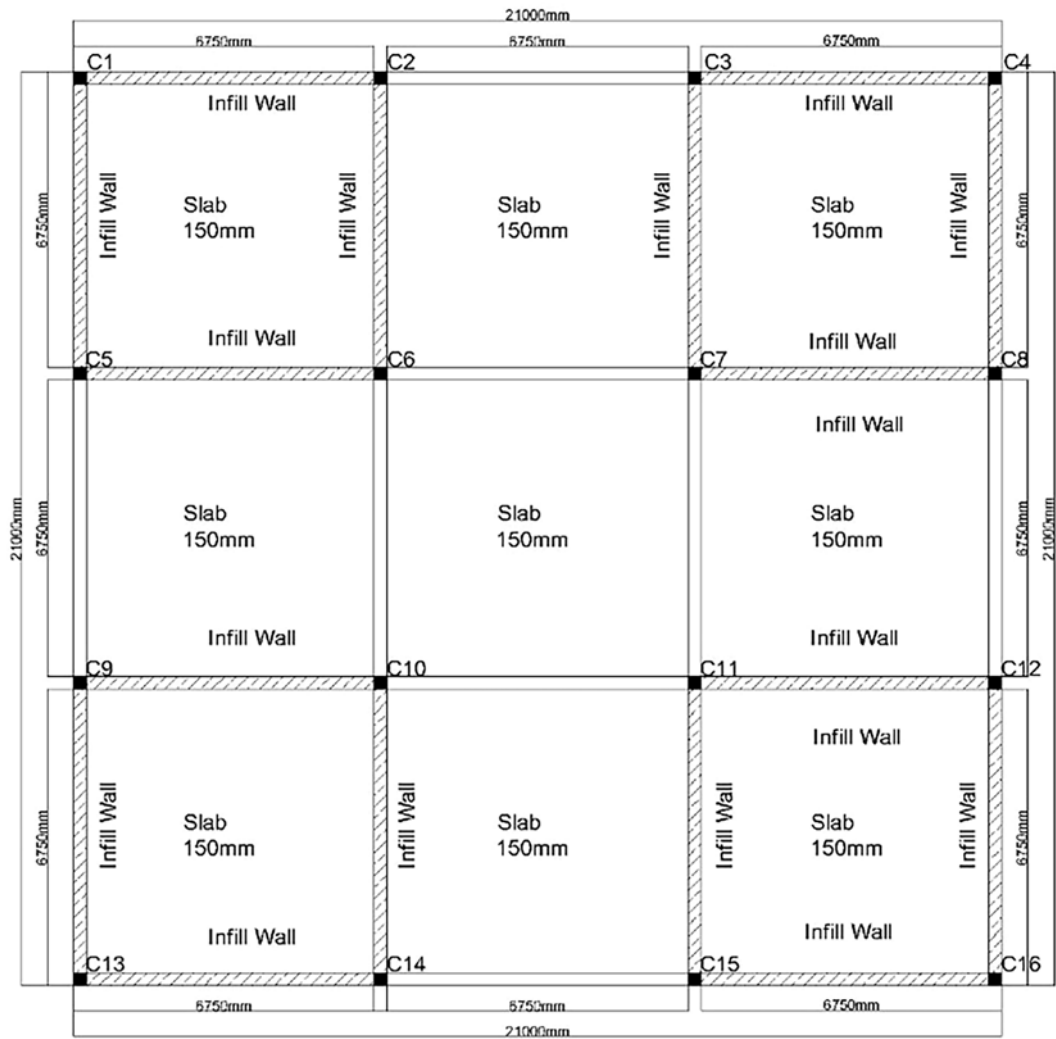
Plan view of the multi-story structural model developed in SAP2000.
